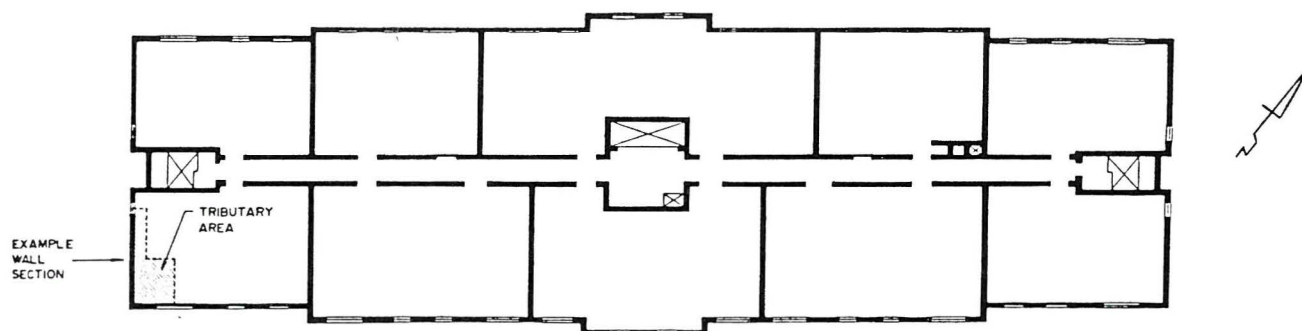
Typical floor plan view of example building with modelled wall section shown.
